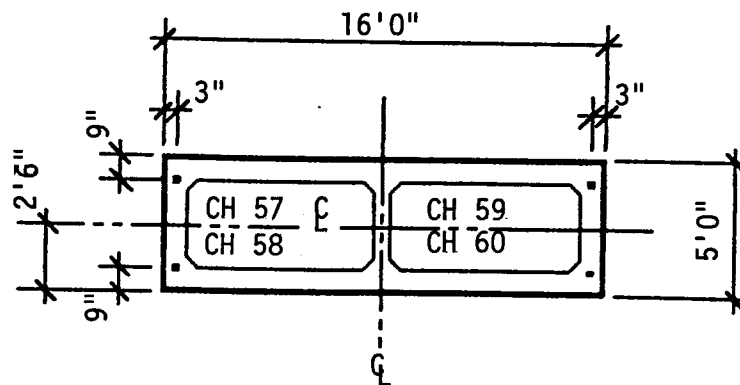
Concrete Strain Gage Layout-Section B-B
